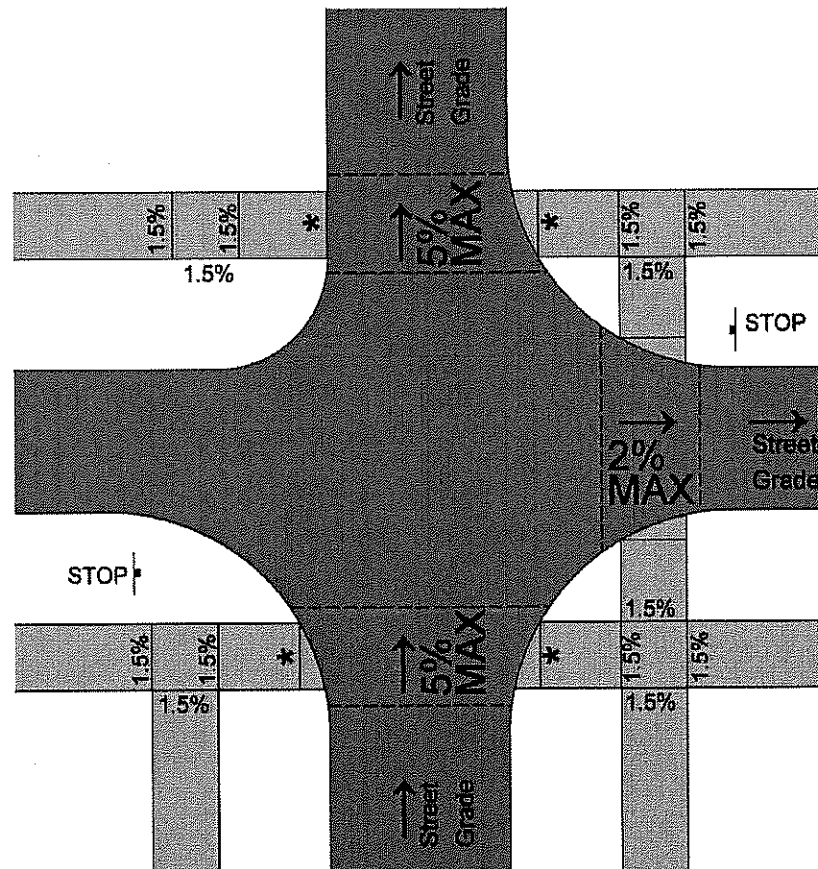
A-2.03: Standard Sidewalk and Curb Ramp Elements
